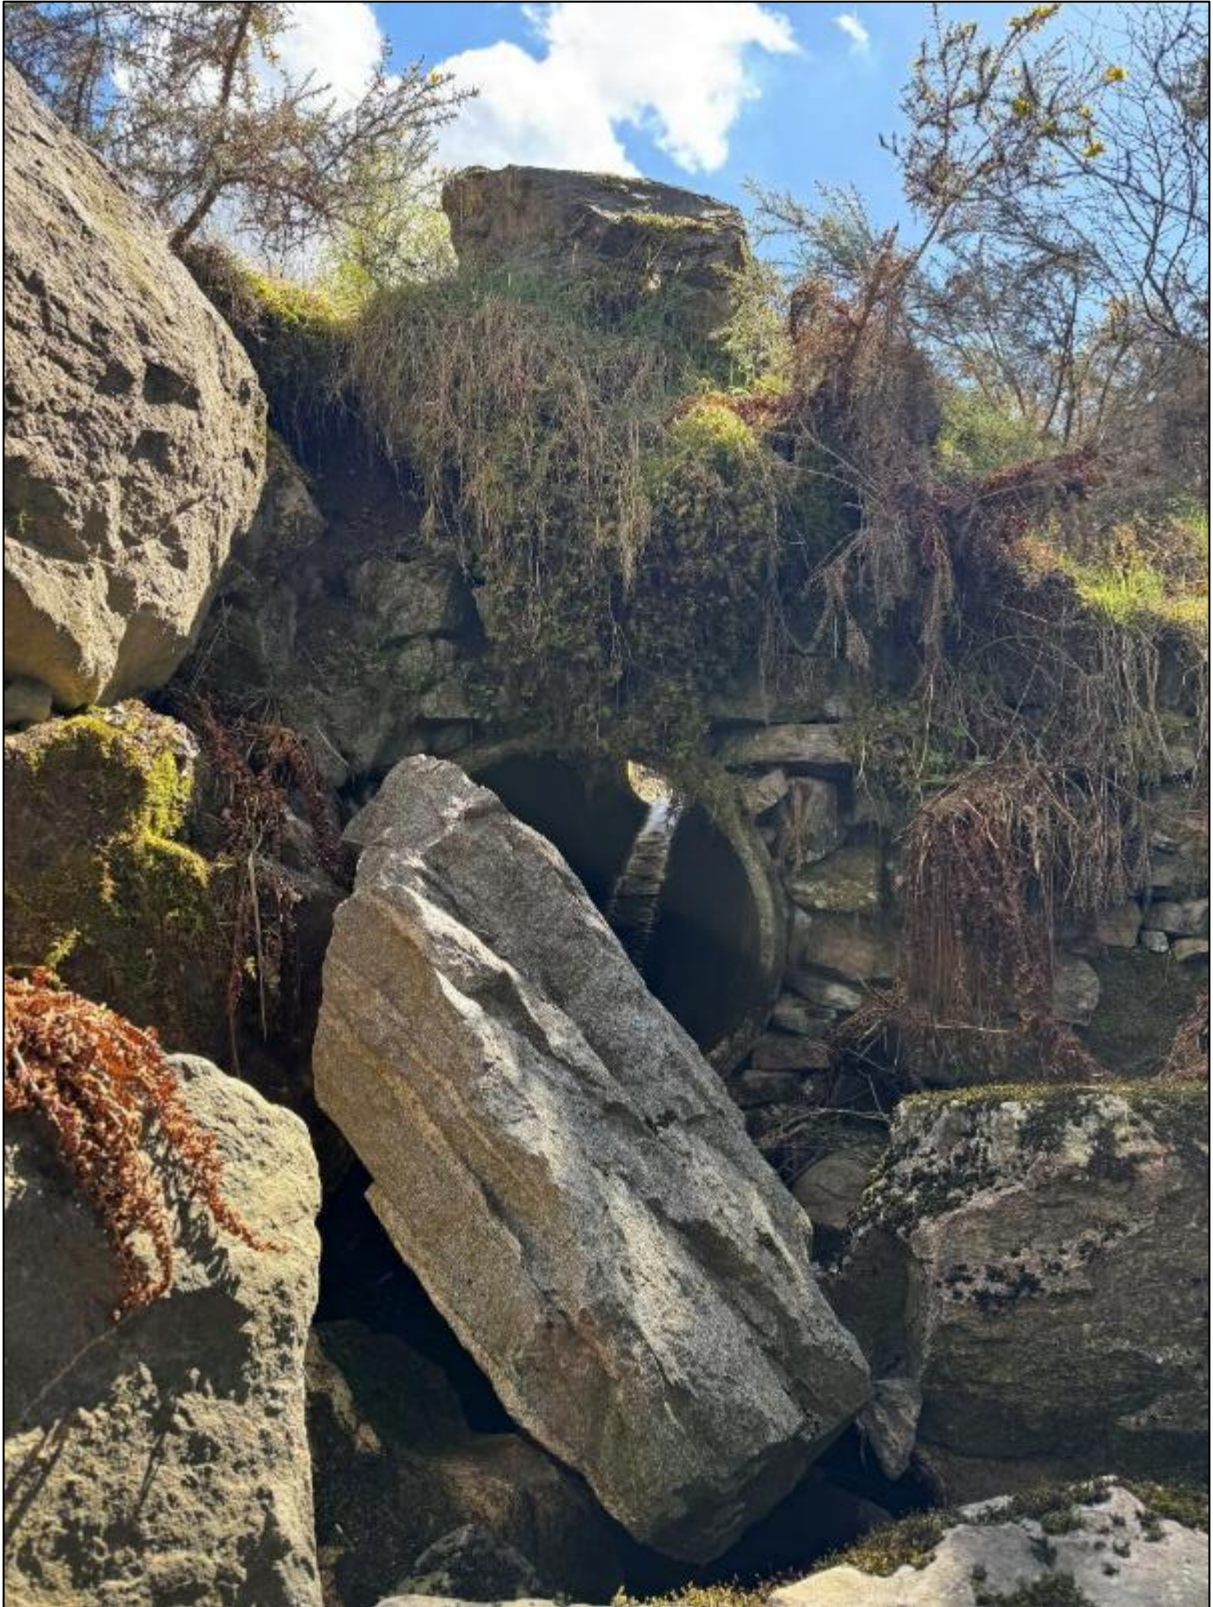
Photograph of stream crossing 25. Culvert outfall.
